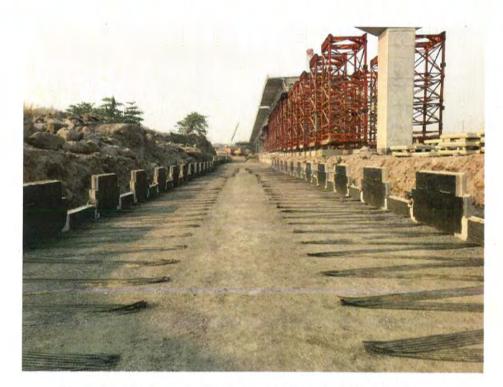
Jasai JM Ramp RE wall Panel erection in progress
